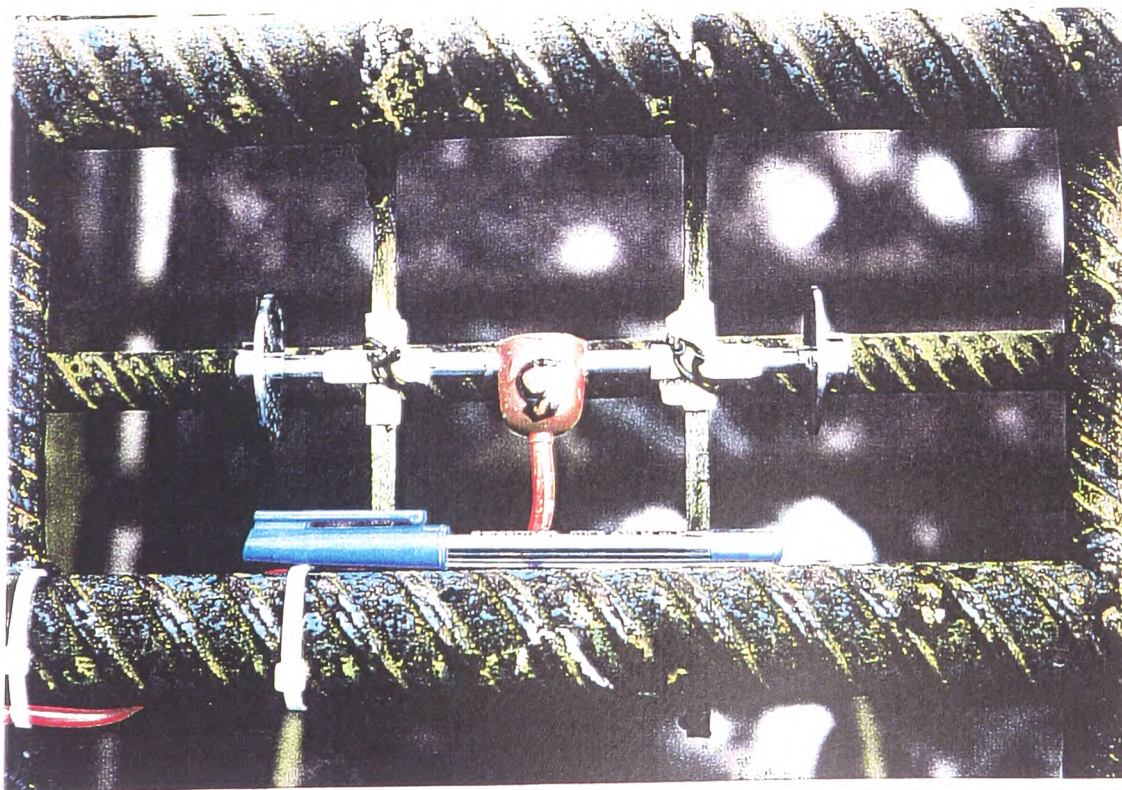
Detail of attaching a vibrating wire strain gauge to the pile reinforcement
